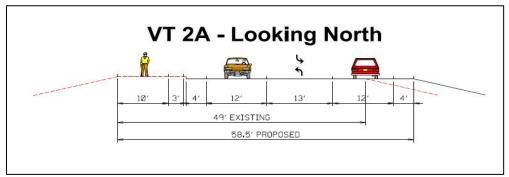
Proposed VT 2A Cross Section Treatment North of Industrial Avenue
